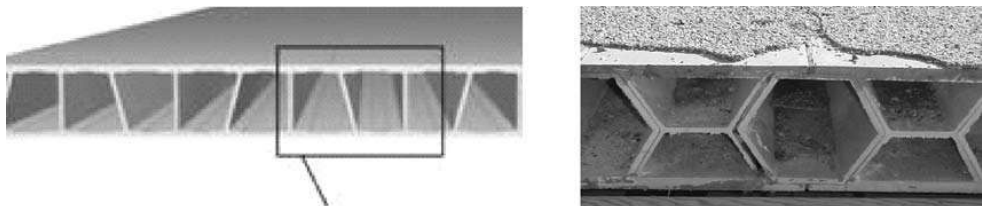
Hollow core sandwich configuration (Photograph from NCHRP Report 564 – Field Inspection of In-Service FRP Bridge Decks)
